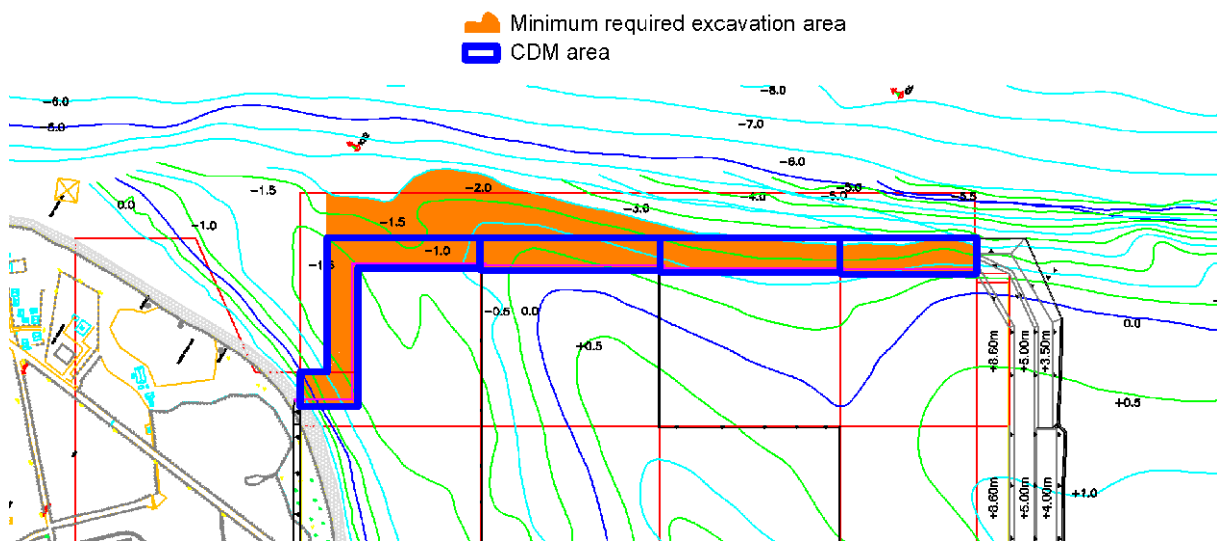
Minimum required excavation area for CDM Ship (Excavation up to CDL-2.0m)
